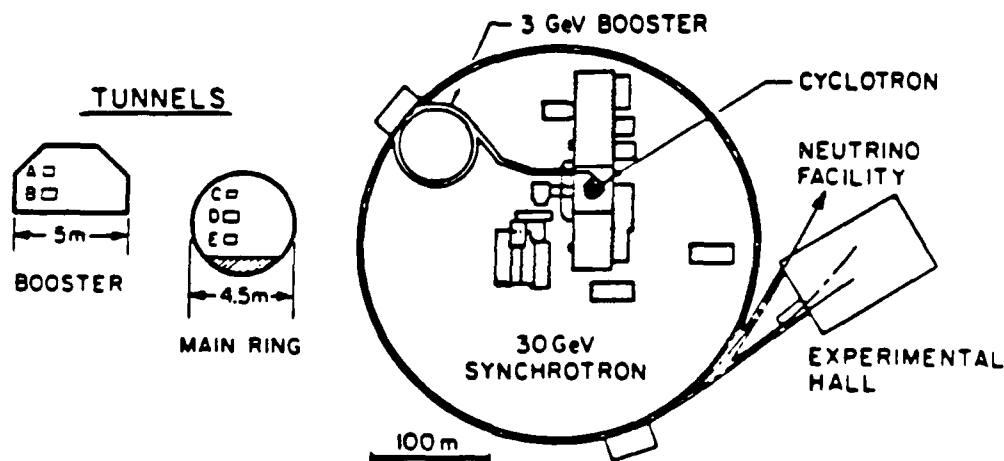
Proposed layout of the accelerators and cross sections through the tunnels.
